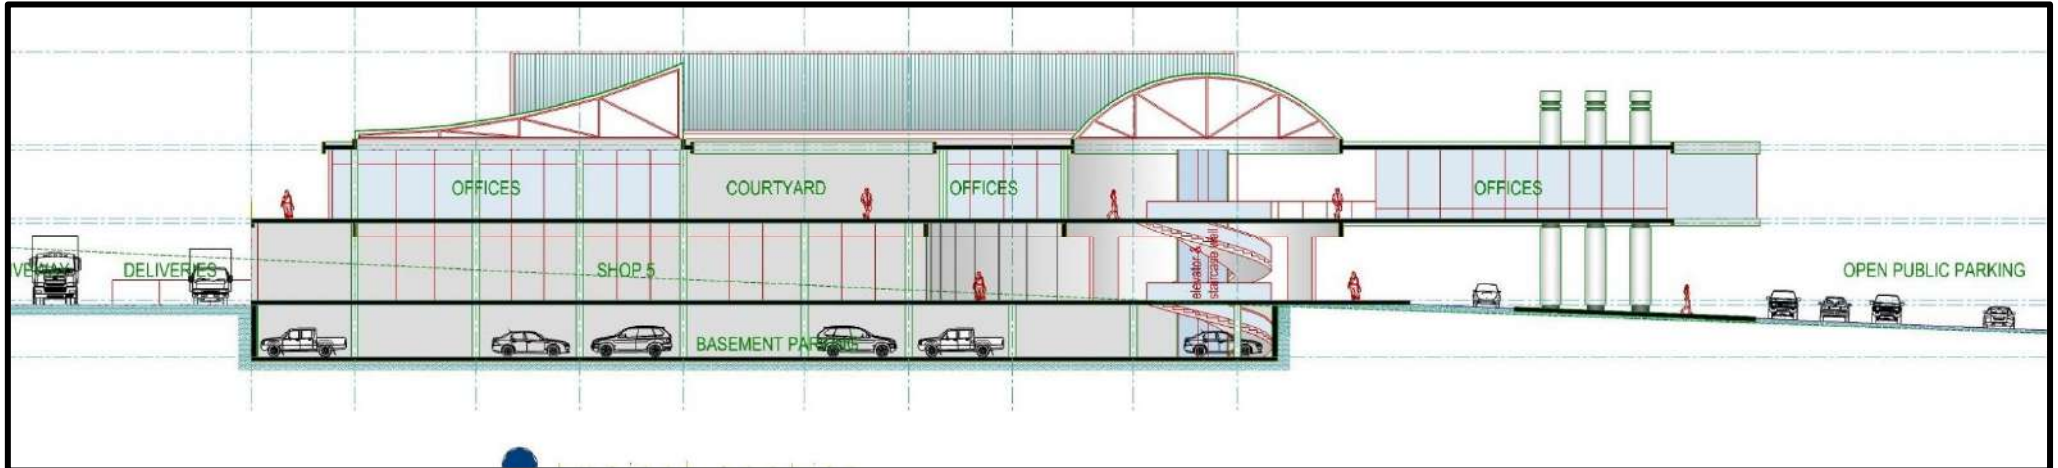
Side view of the proposed retail centre (designed by Michael M. Payne & Associates Architects, 2020)
